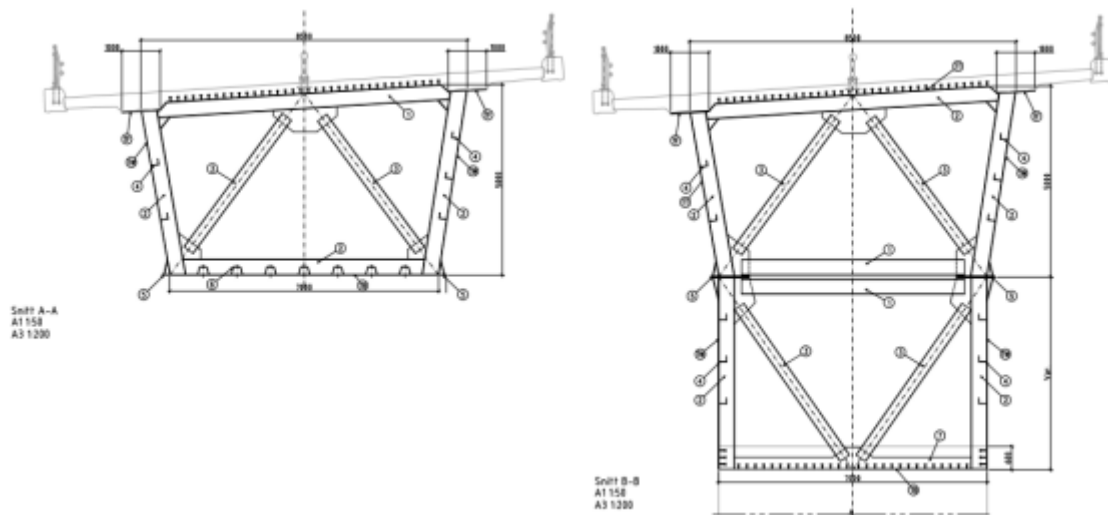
Cross section of Randselva bridge. Left shows the cross-section at mid span. Right is the cross-section at pillars [65]
